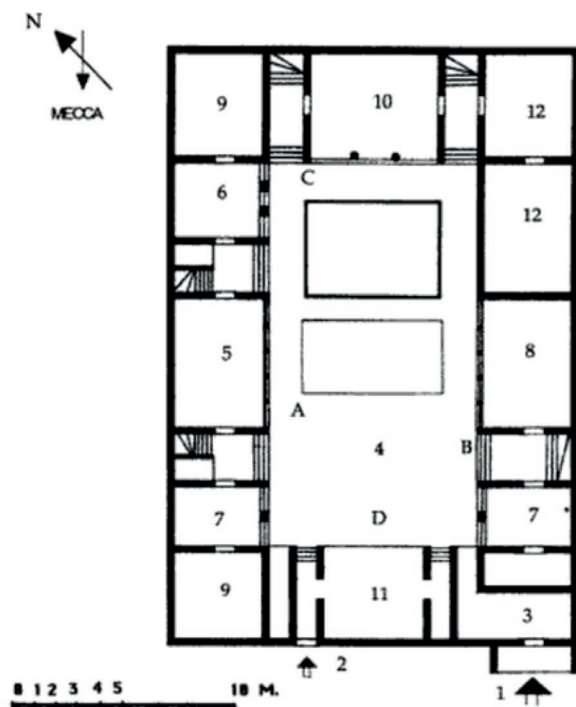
Floor plan of a traditional Iranian courtyard dwelling
